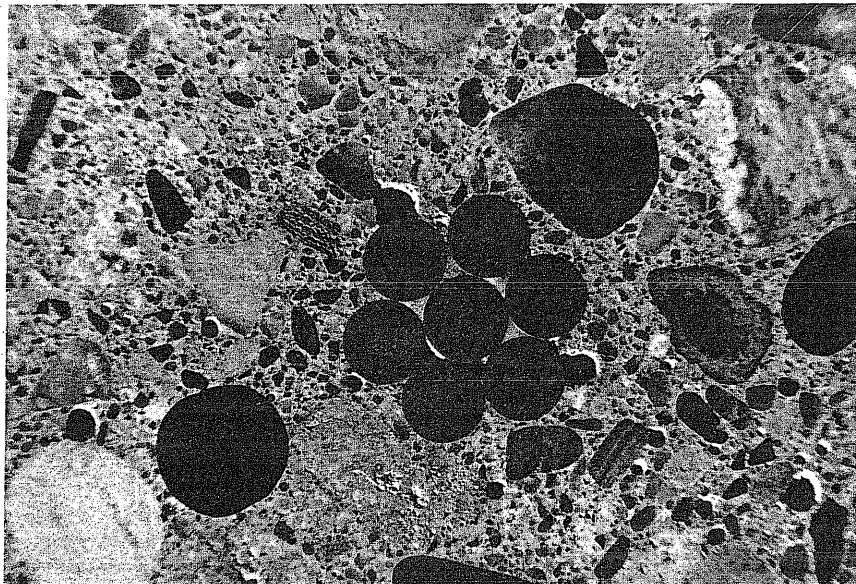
CROSS SECTION THROUGH THE SAME SPECIMEN AS SHOWN IN FIG. 12.13 LOCATED ONE in. FROM CROSS SECTION A
